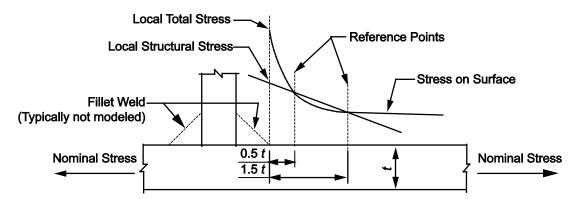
Local Structural Stress for Level 3 Design of Orthotropic Decks
